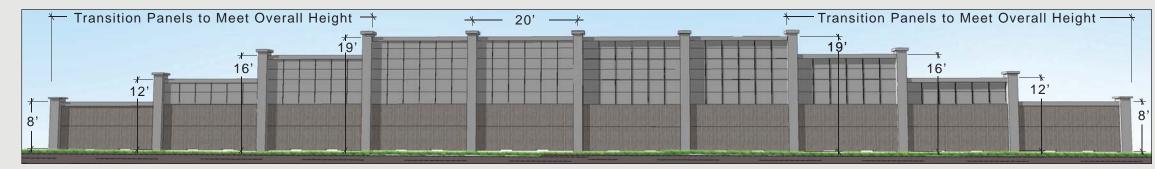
Noise Wall Elevation with Transition Panels - 19' Height Wall
